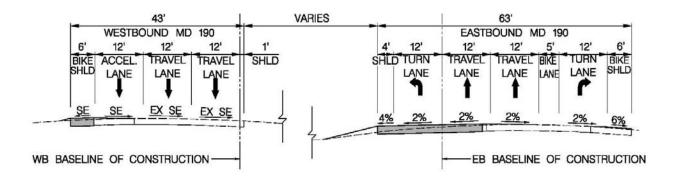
Alternative 2 - MD 190 Intersection West of Pyle Road
